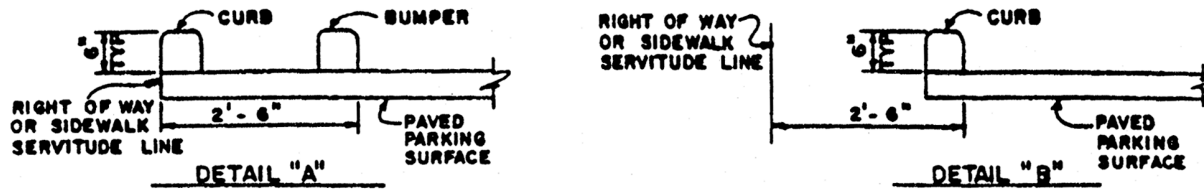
PARKING DESIGN DETAILS—CURBING AND WHEEL STOPS
